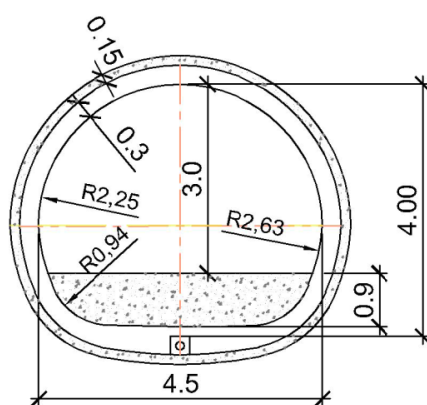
Typical cross-section of extraction tunnel N.B. rock bolts omitted.
